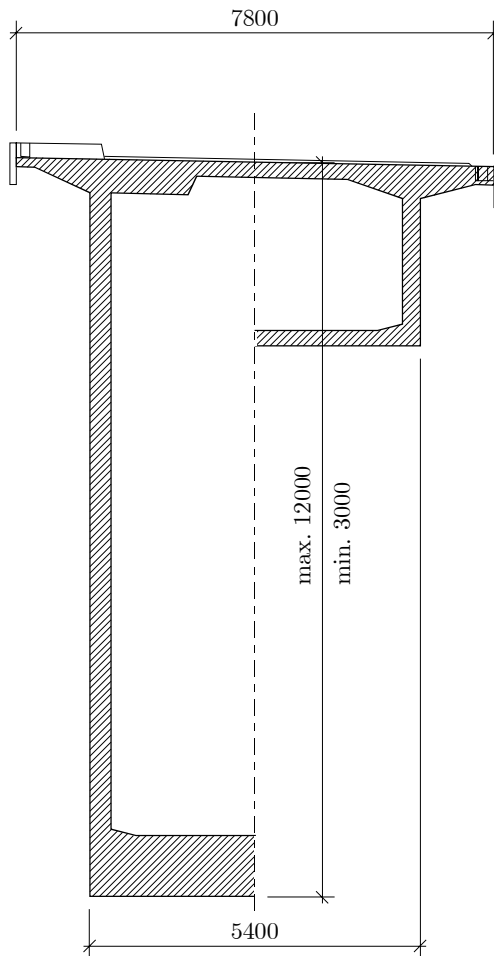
A typical arrangement of the box-girder, Støvset Bridge
